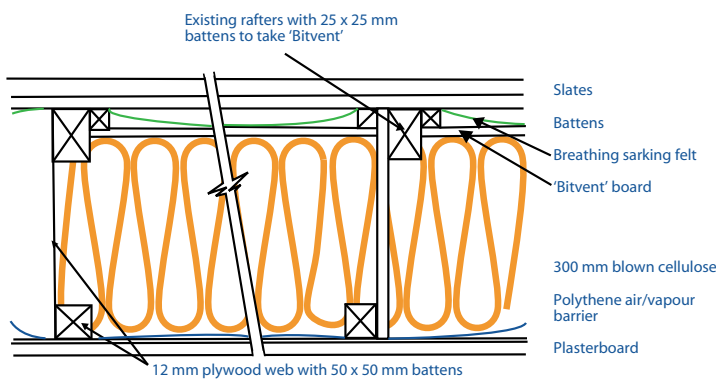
Plan section through the roof showing the new L beams added to existing roof structure
